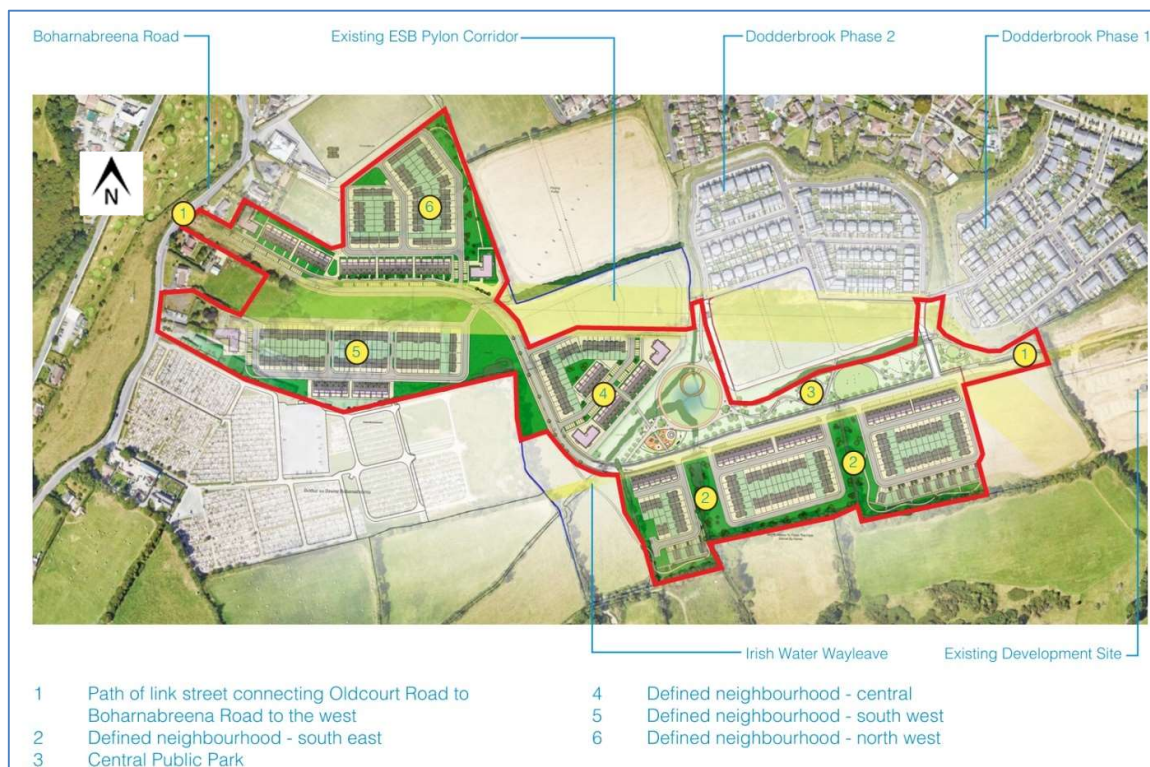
Earlier alternative design layout as discussed at S.247 pre-planning meeting with Planning Authority on 30th June 2023
